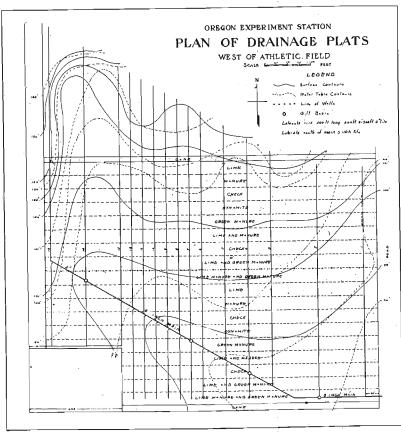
Plan of Drainage Plots on Experiment Station Farm.
